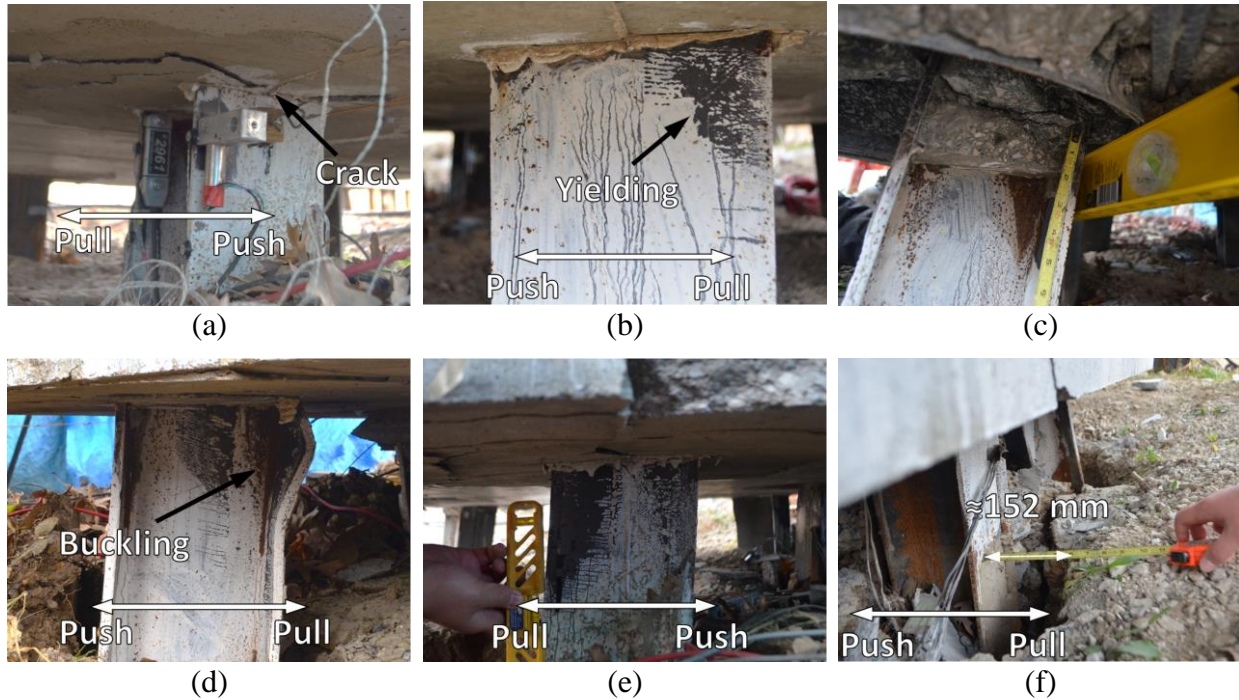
Crack at column-to-grout pour interface
